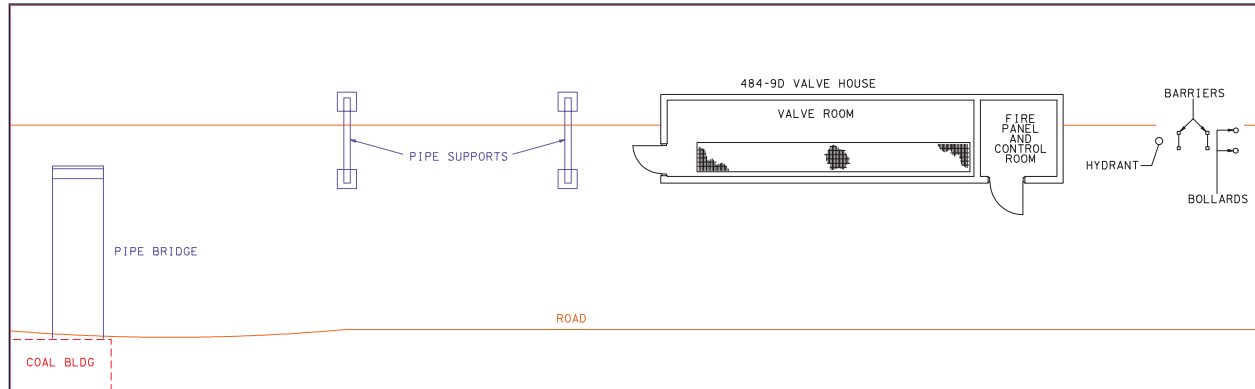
Building 484-9D, D-Area Valve House and Ancillary Facilities Layout
